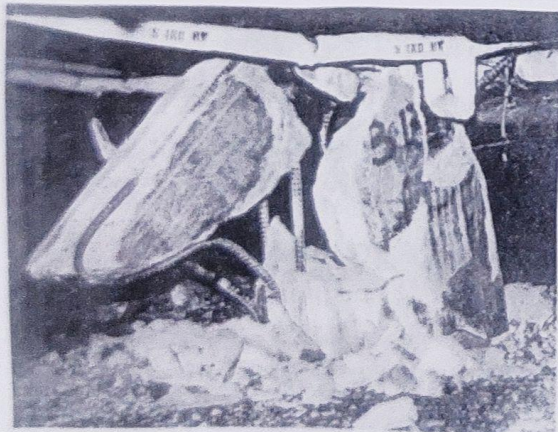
Shear failure of RC Column in ground storey floor rests on tables and chairs
